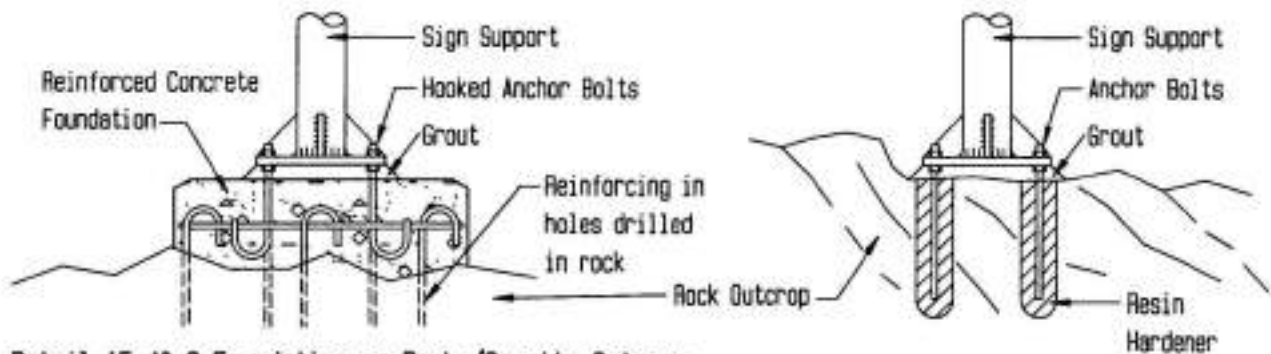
Reinforced Foundations: Anchor Bolts and Reinforcing Set in Concrete
